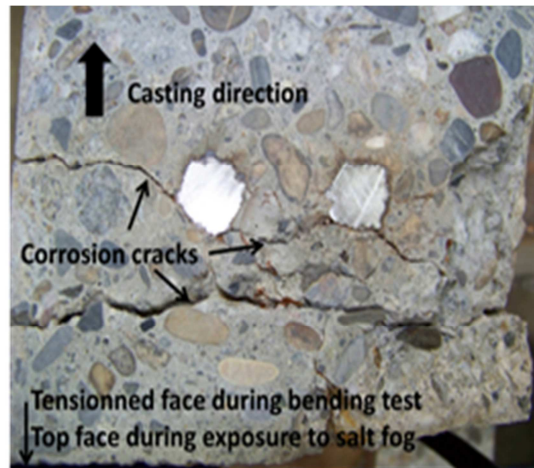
Corrosion-induced cracks appear in the concrete cover from the steel part closest to the tensioned surface exposed to chloride for type “A” beams (Almassri et al.(13))
